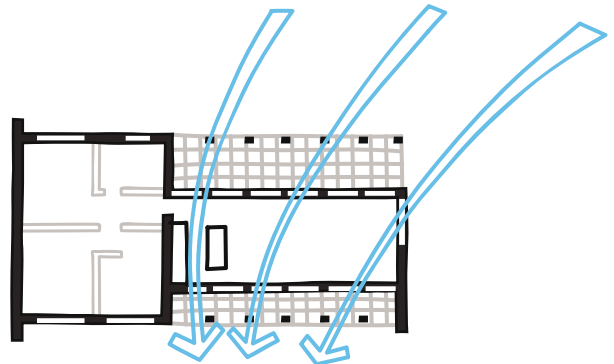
This house is designed around the central breezeway that extends from entry door to outdoor patio area in the direction of the prevailing north-easterly breeze.
